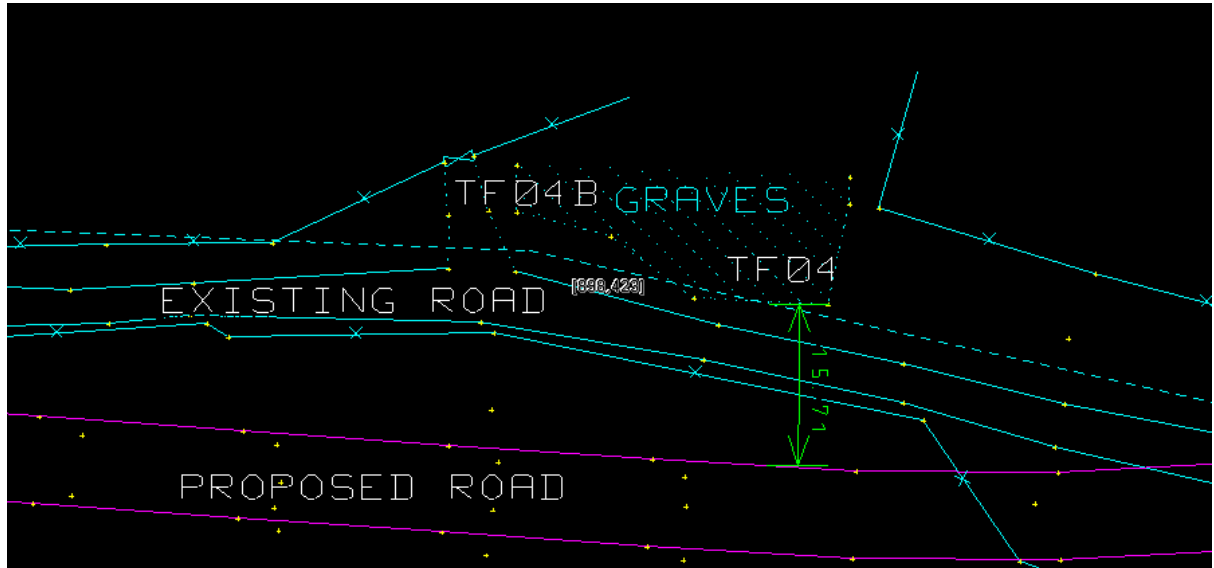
Position of grave site TF04 adjacent to the new road alignment (Source: Neil Brand).
